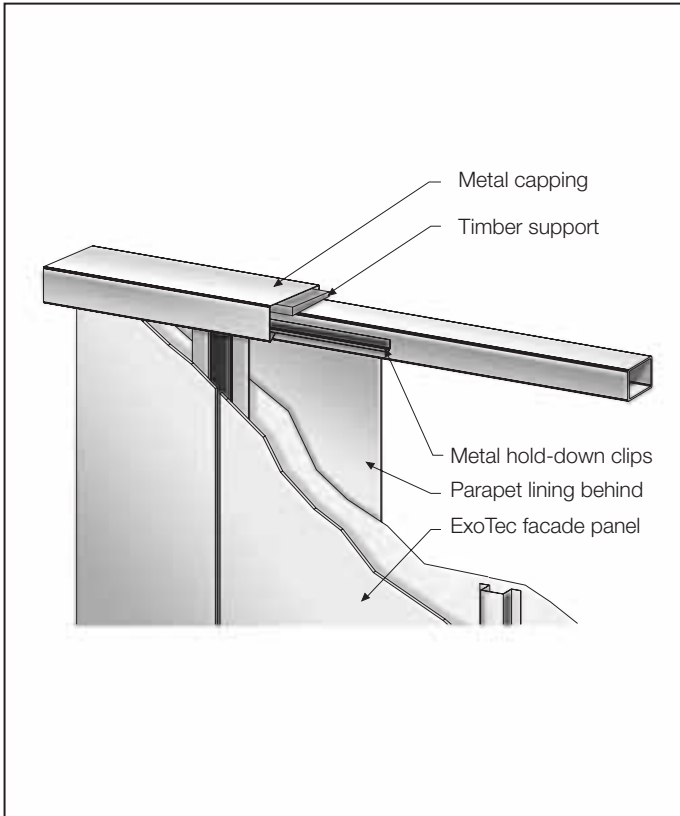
PARAPET CAPPING CUTAWAY DETAIL 1
